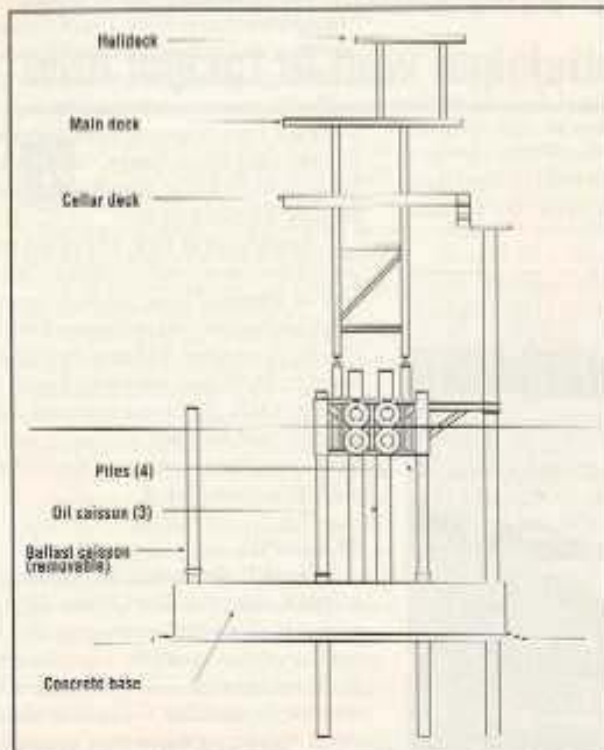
This side elevation view drawing shows the tank and steel platform as they are mated offshore.
